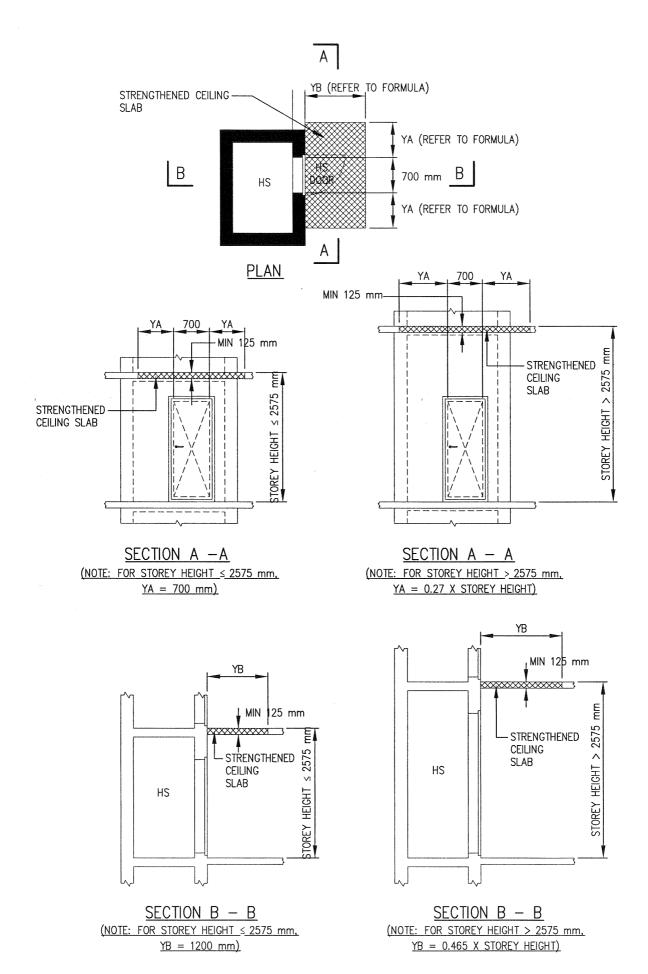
REQUIREMENTS FOR STRENGTHENED CEILING SLAB IN FRONT OF HS DOOR
